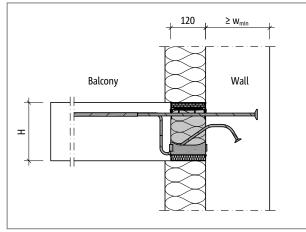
Schöck Isokorb® XT type K-U: Wall connection upwards with external insulation
